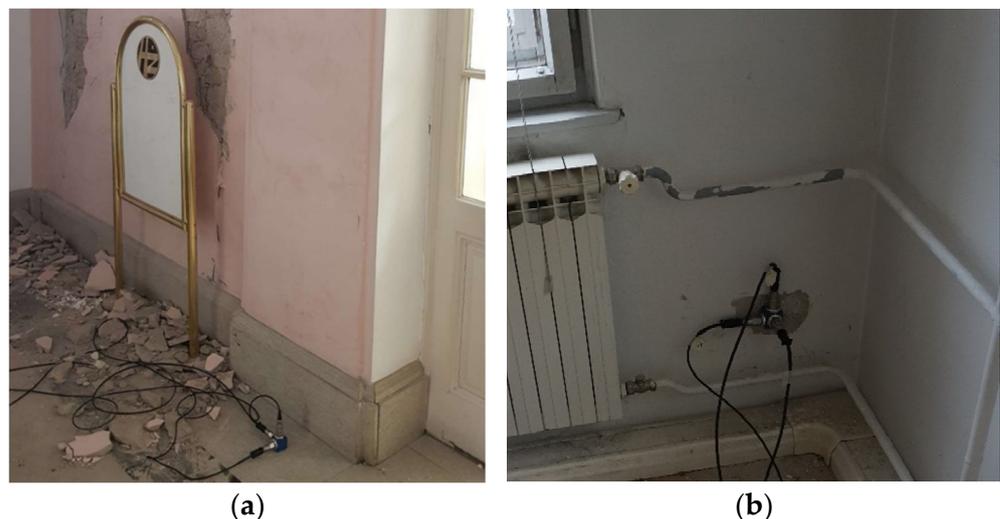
Accelerometer placement on the (a) rigid floor surface and (b) masonry wall structure.
